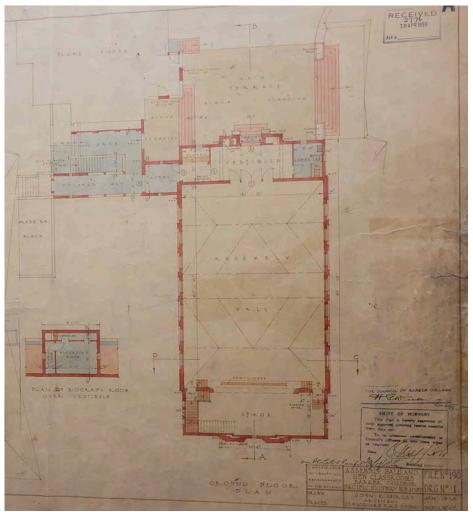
Ground floor plan for 'Assembly Hall and New Classrooms' at Barker College, prepared by John K. Shirley, architect, dated January 1938. (Source: Barker College Archives, Plan M0009).
